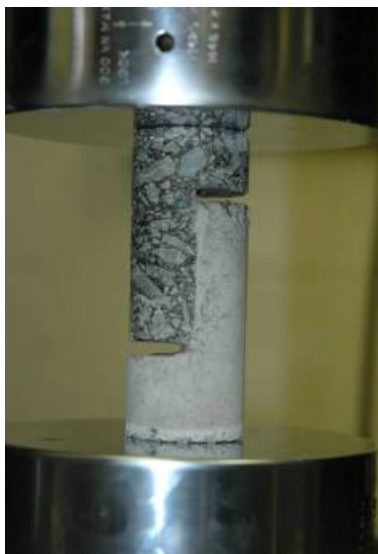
Lap Joint Sample Under Quasi-static Loading
